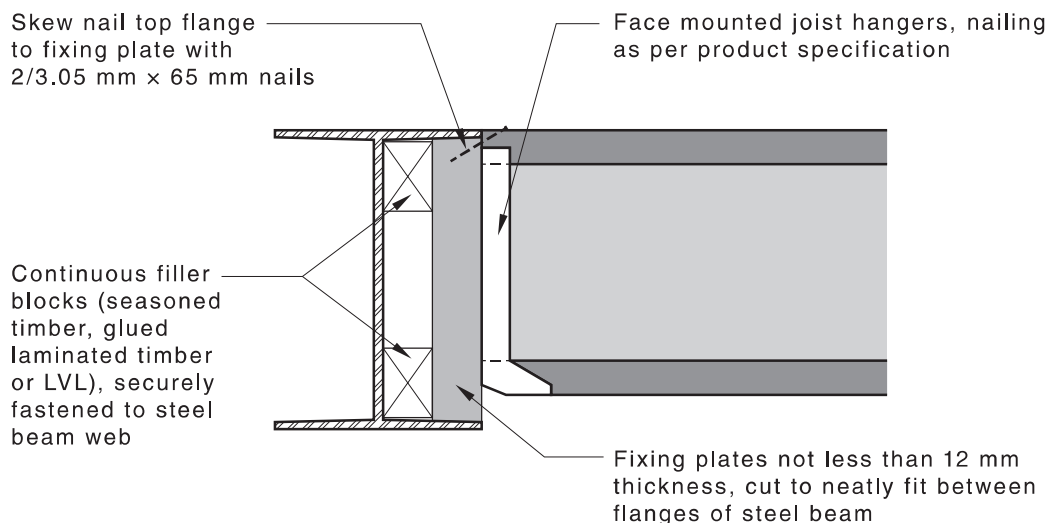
Connection of I-joists to a steel beam — Method 1
